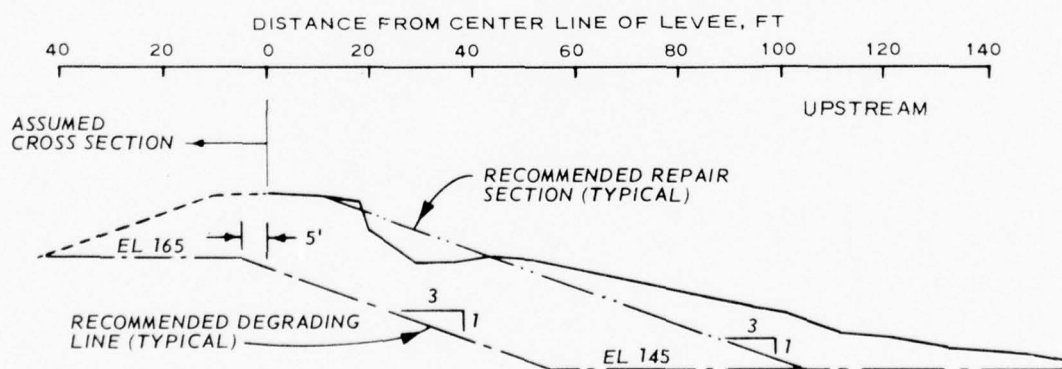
A schematic of slide conditions, Wallace Lake Dam, New Orleans District, at sta 38+50
